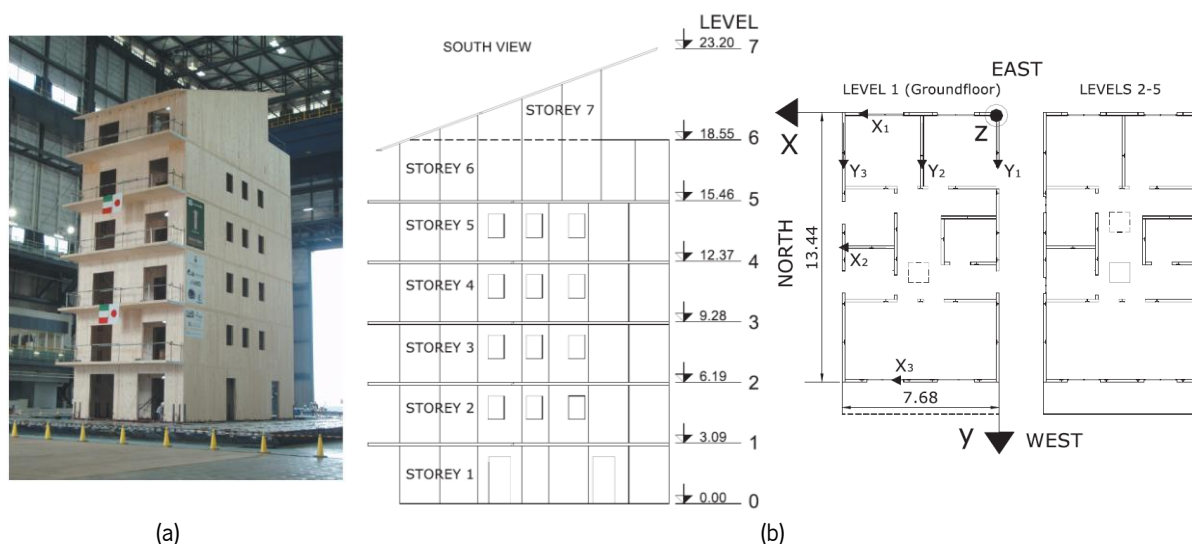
Panoramic image (a) and plans (b) of 7-story CLT building [24, 25].
